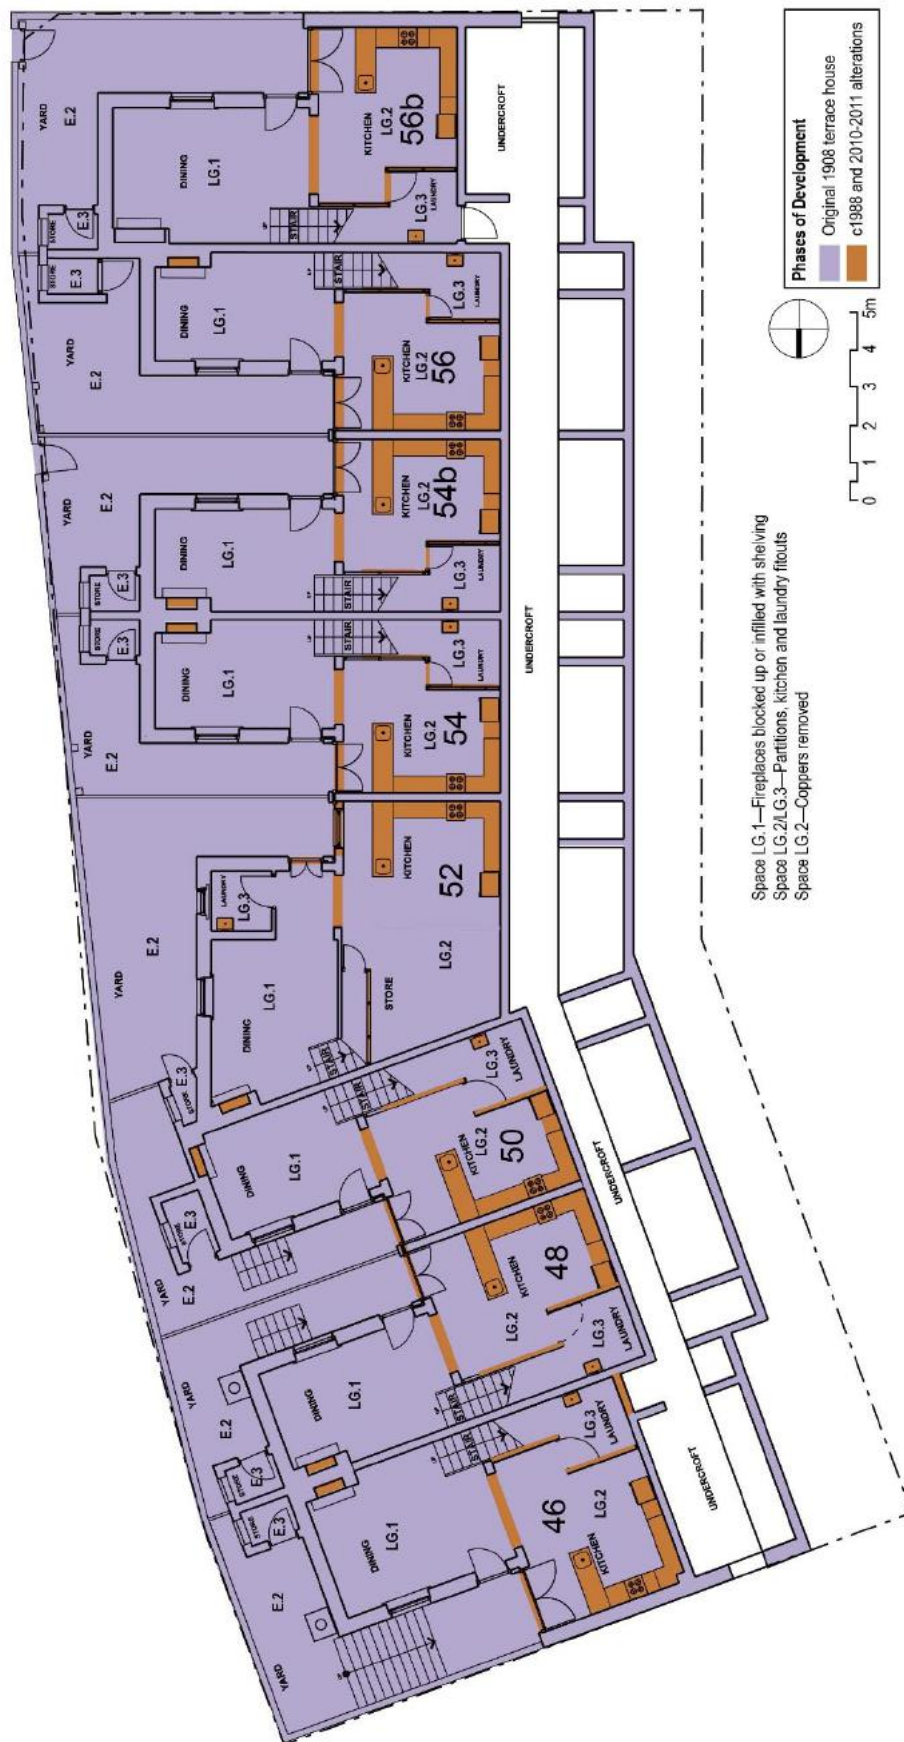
Diagram showing periods of construction—lower ground floor plan (lower flats). (Source: LAHC, with GML overlay 2016)
